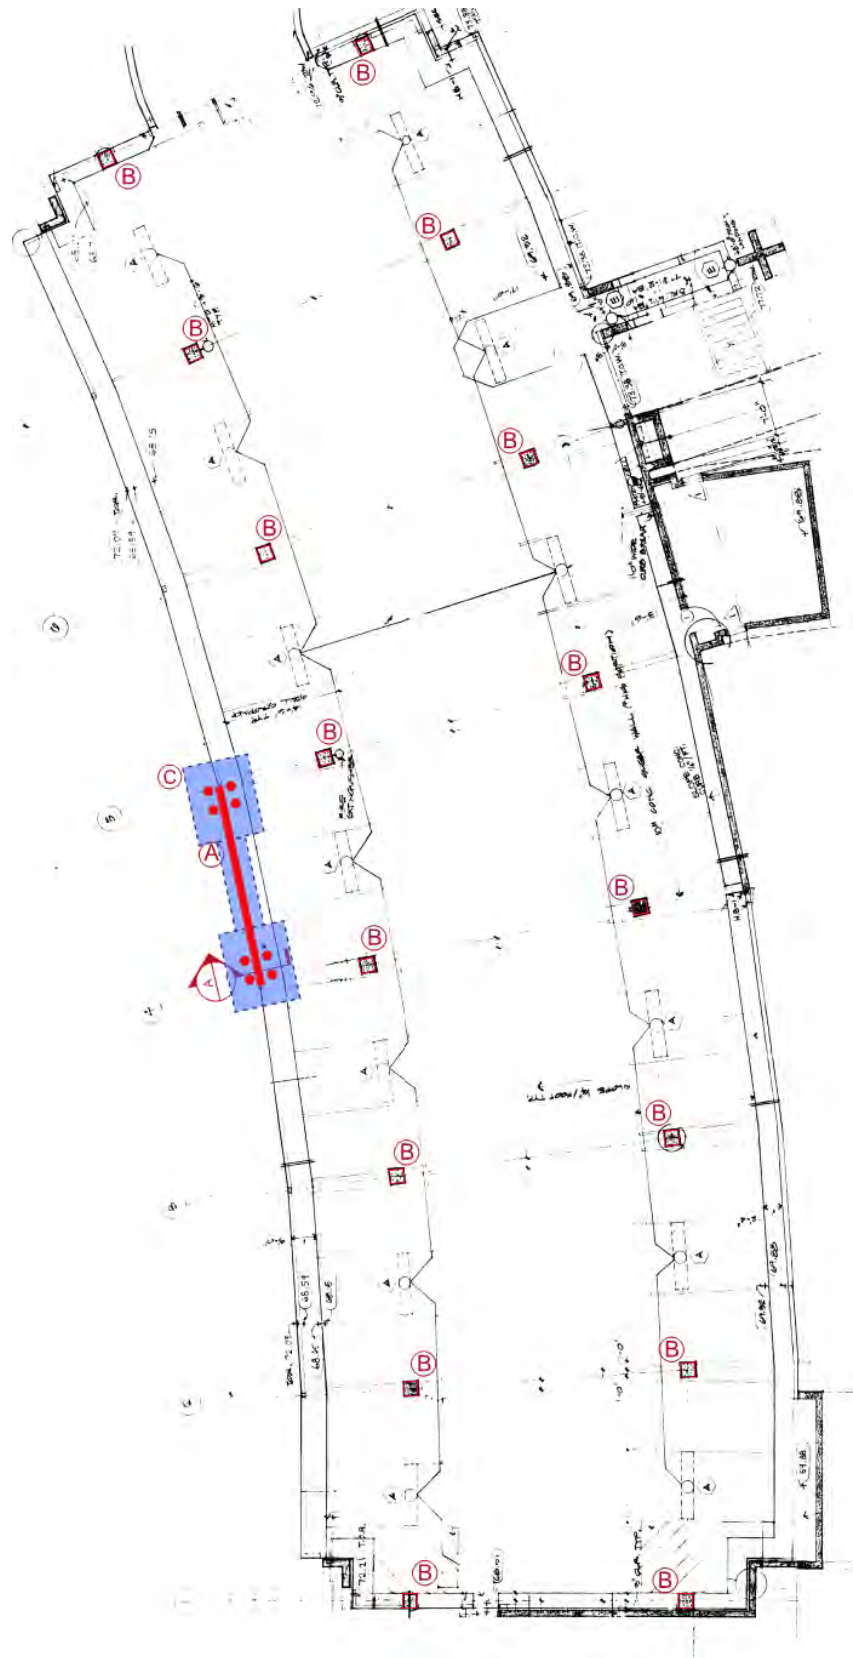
Typical floor plan at Parking Garage indicating: A=proposed location of retrofitted shear wall; B=concrete columns; C=new footing (also shown as purple boxes)
